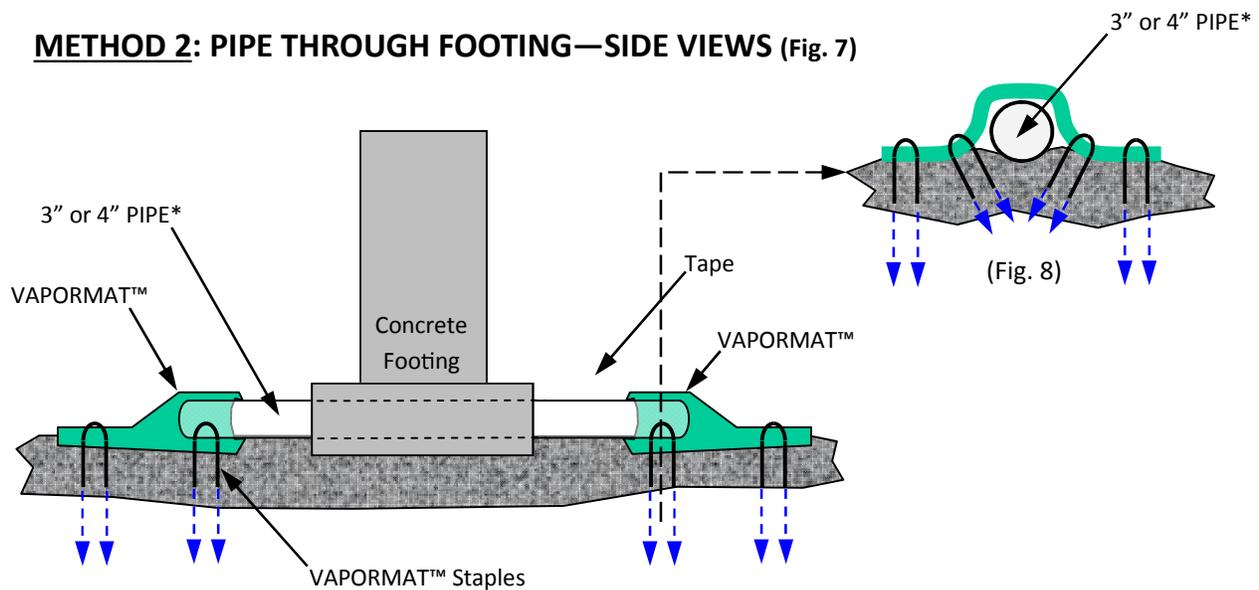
DETAILS: BRIDGING A FOOTING—MTEHOD 2
